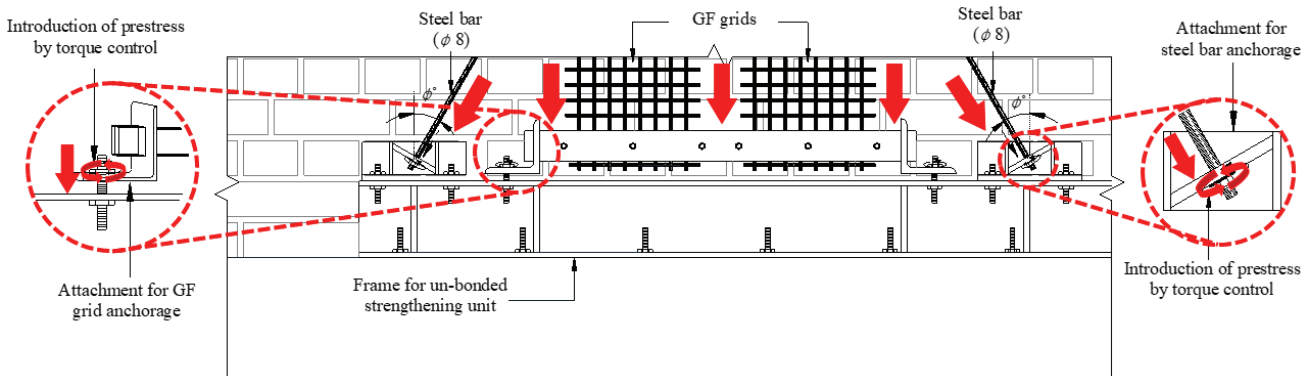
Detail of un-bonded strengthening technique for masonry walls by using prestressed steel bars and GF grids
